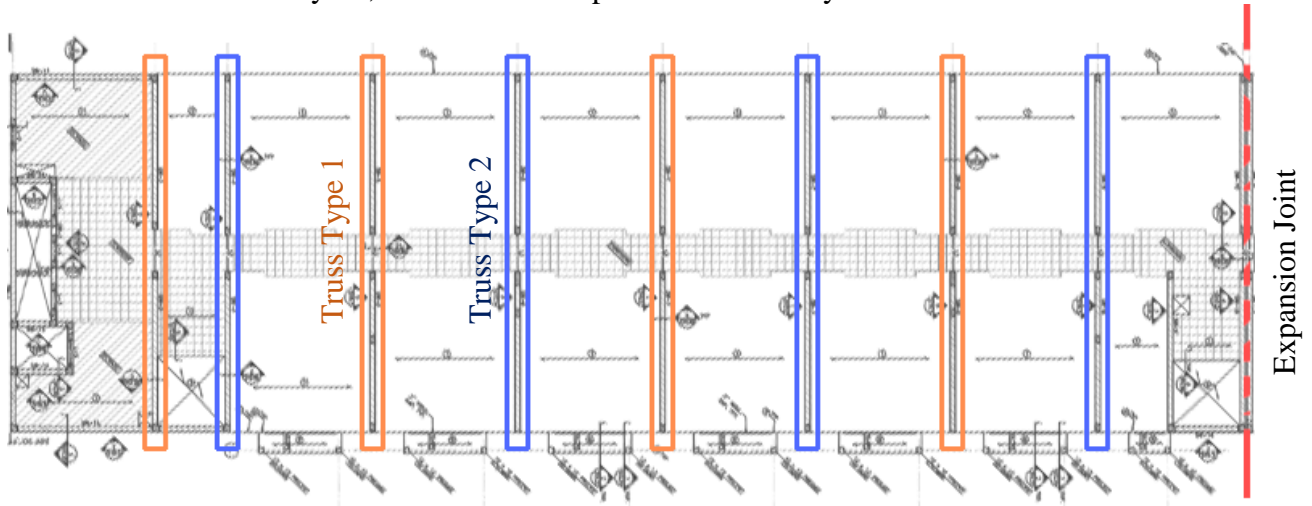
Staggered Truss Layout of Typical Floor Plan (4th Floor)
